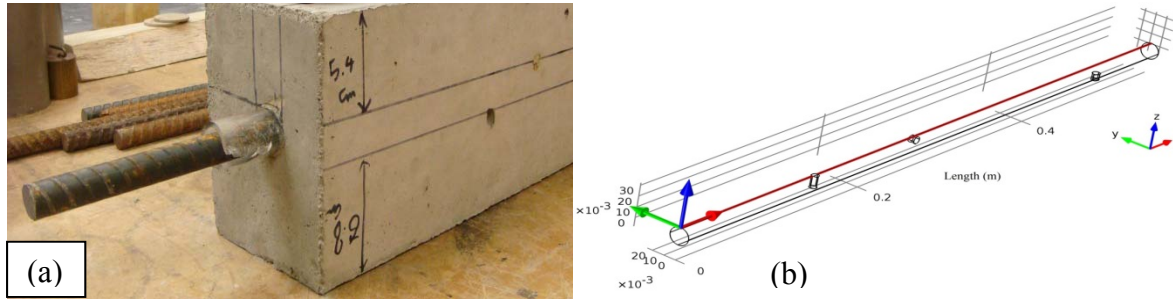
(a). Concrete beam specimen. (b). Three small holes in sound steel reinforcement (rebar).
